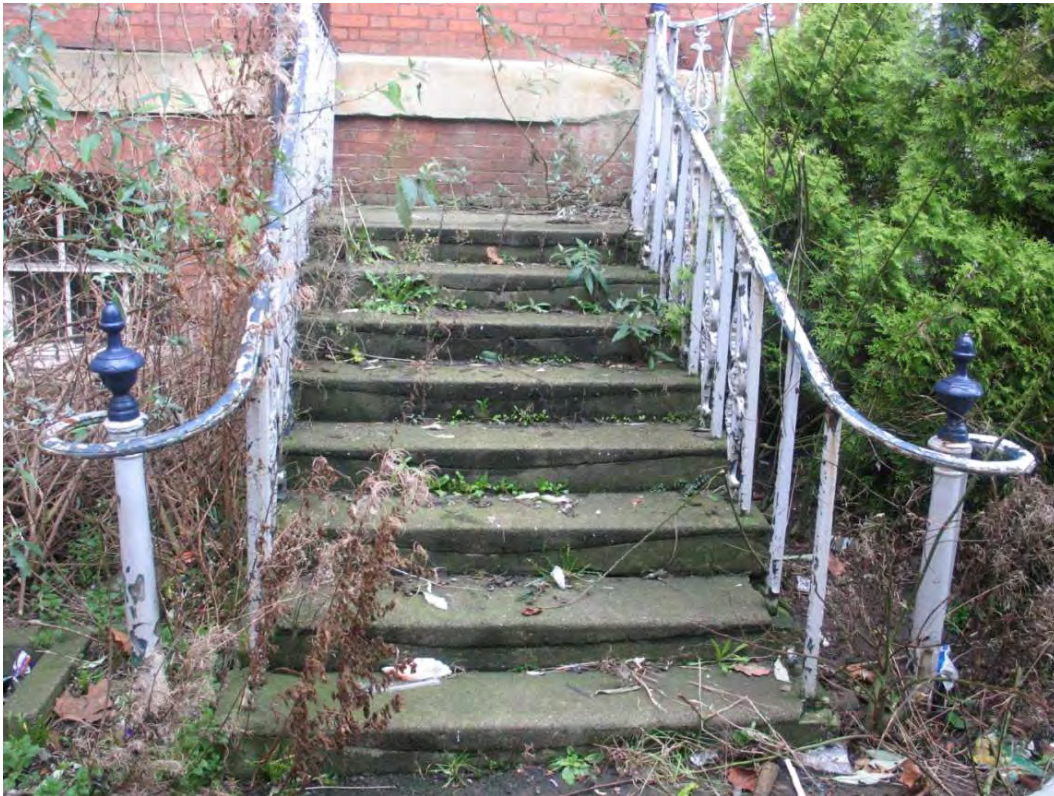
Building 24: detail of principal entrance steps, view to the west
